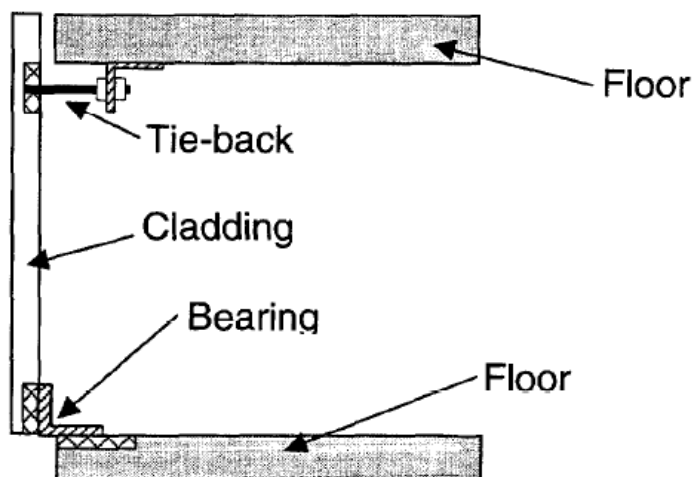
Schematic diagram and typical configuration of cladding system (“Ductile Cladding Connection Systems for Seismic Design”. Barry J. Goodno and James I. Craig. Building and Fire Research Laboratory. National Institute of Technology. (1998))
